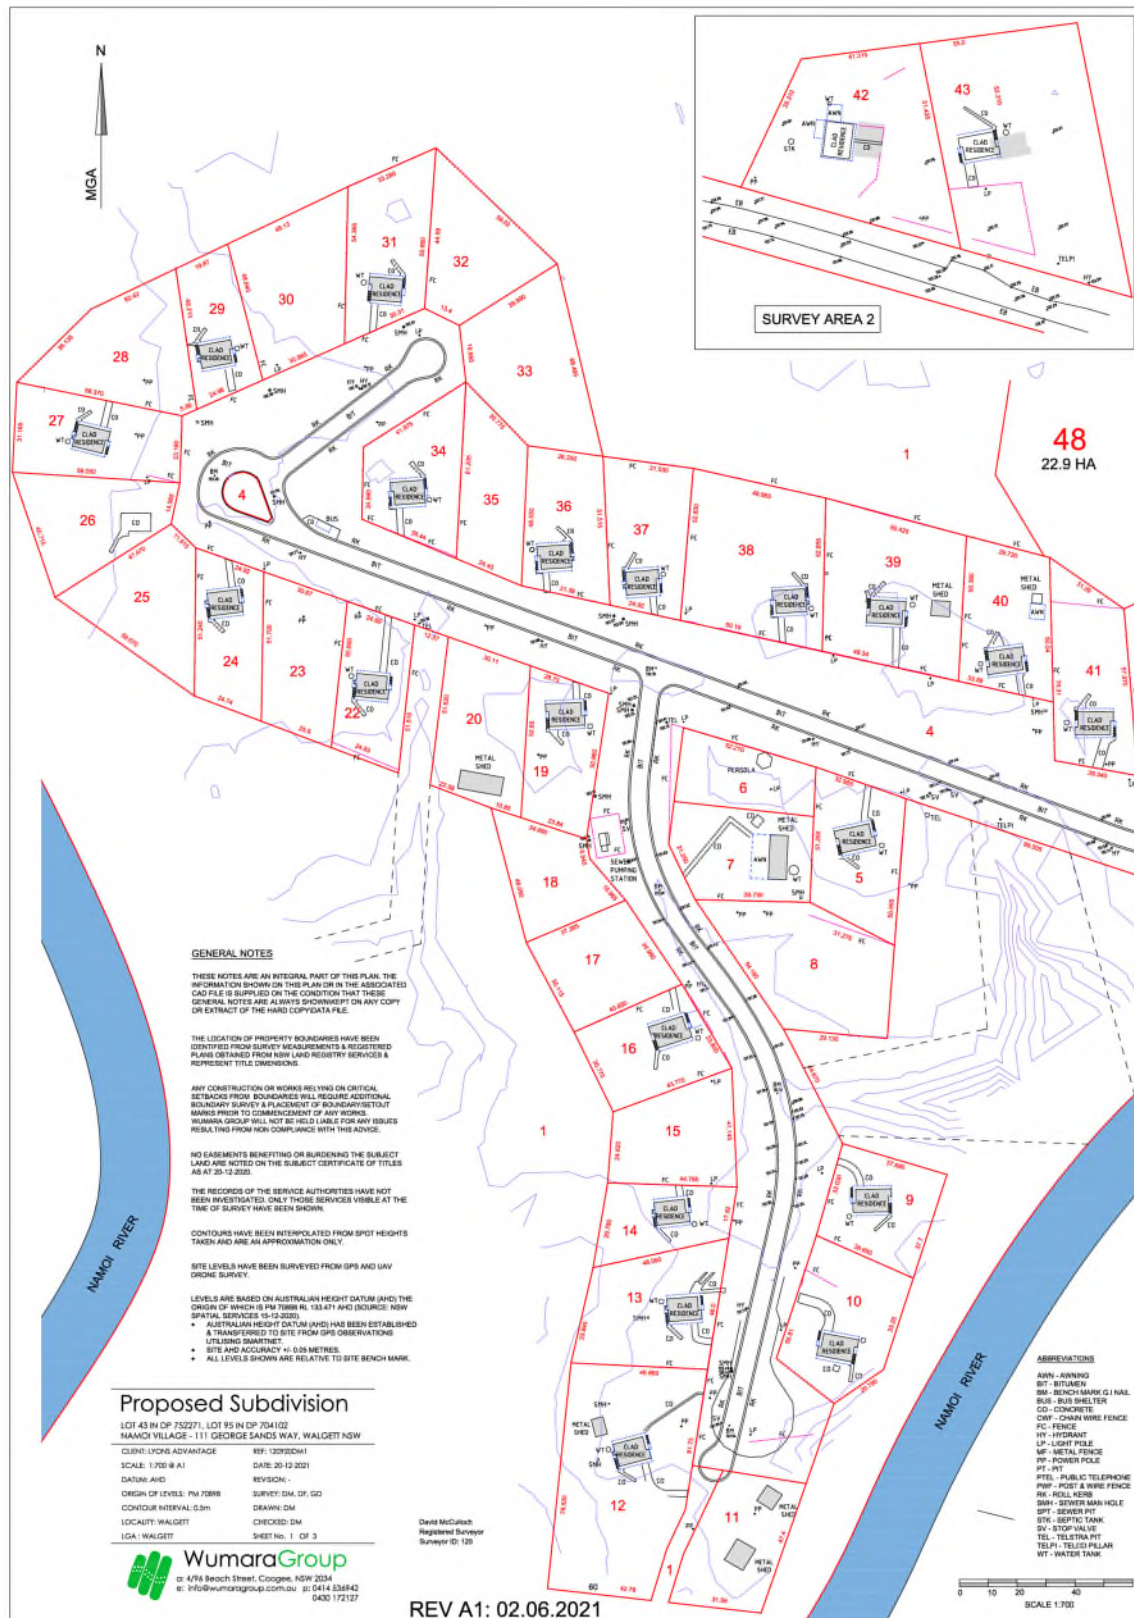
Subdivision Layout Detail – Survey area 2 is not intended for subdivision.
